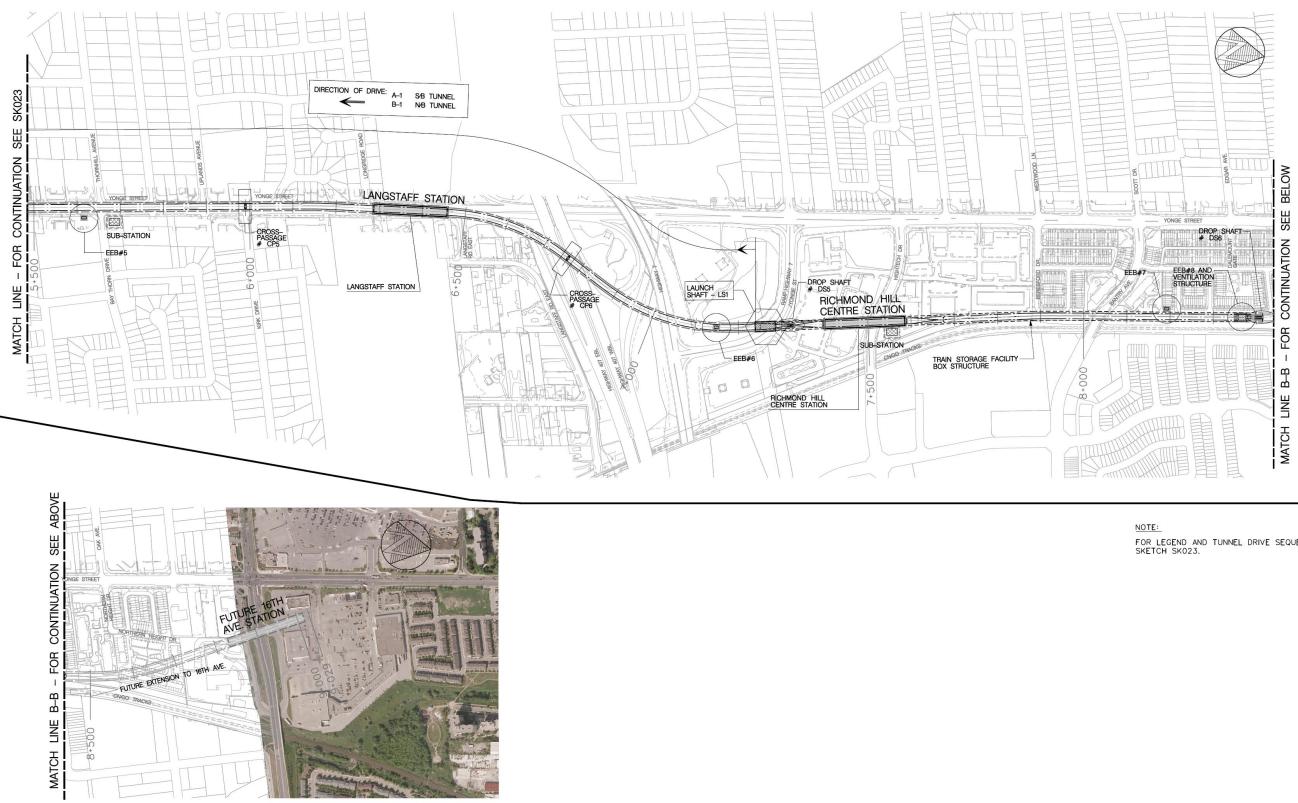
Proposed Tunnelling General Arrangement (North of the East Don River Bridge to RHC Station)
